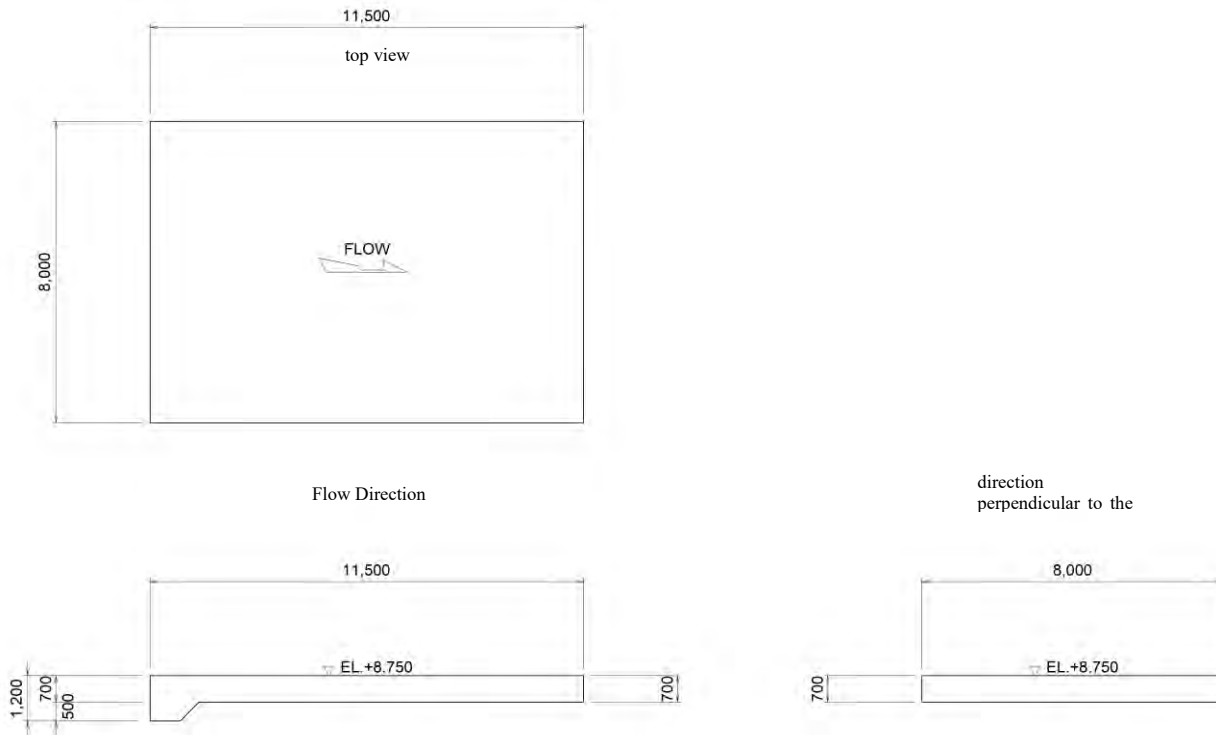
Downstream Aproned Pile Foundation Calculation Result (Left Bank)
